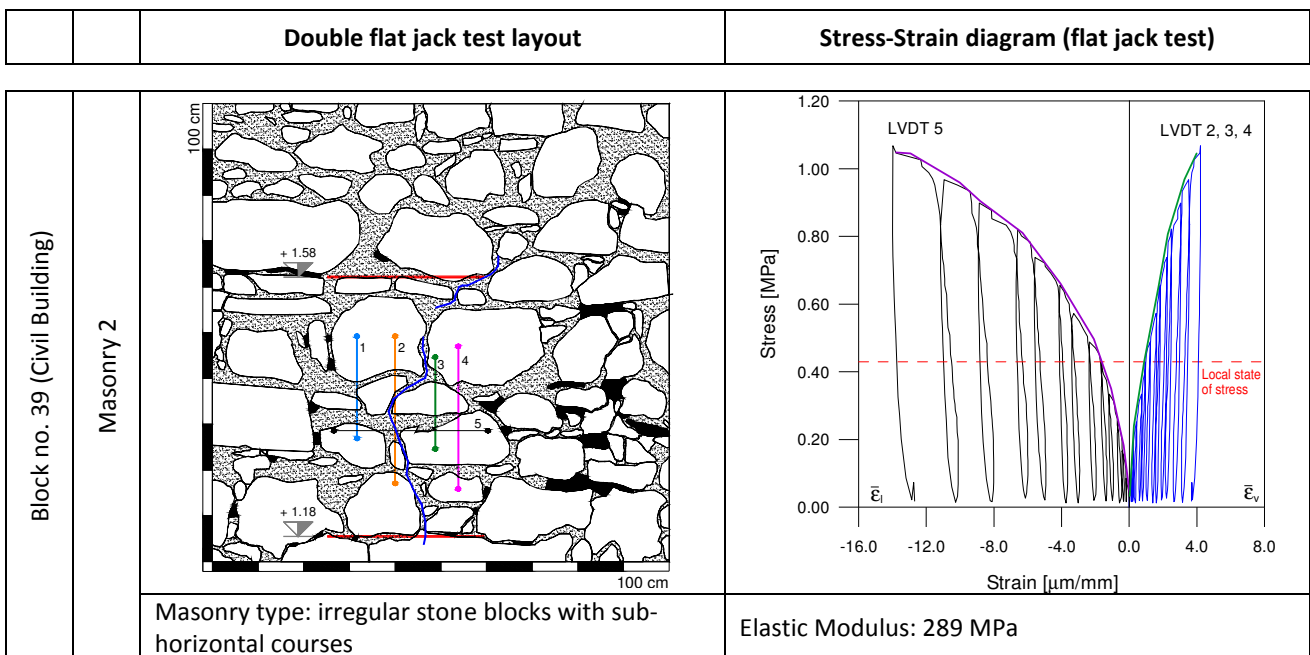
Double flat jack test carried out on masonry 2 in block 39: layout of the test and stress-strain graph (layout and elaboration by the author)
